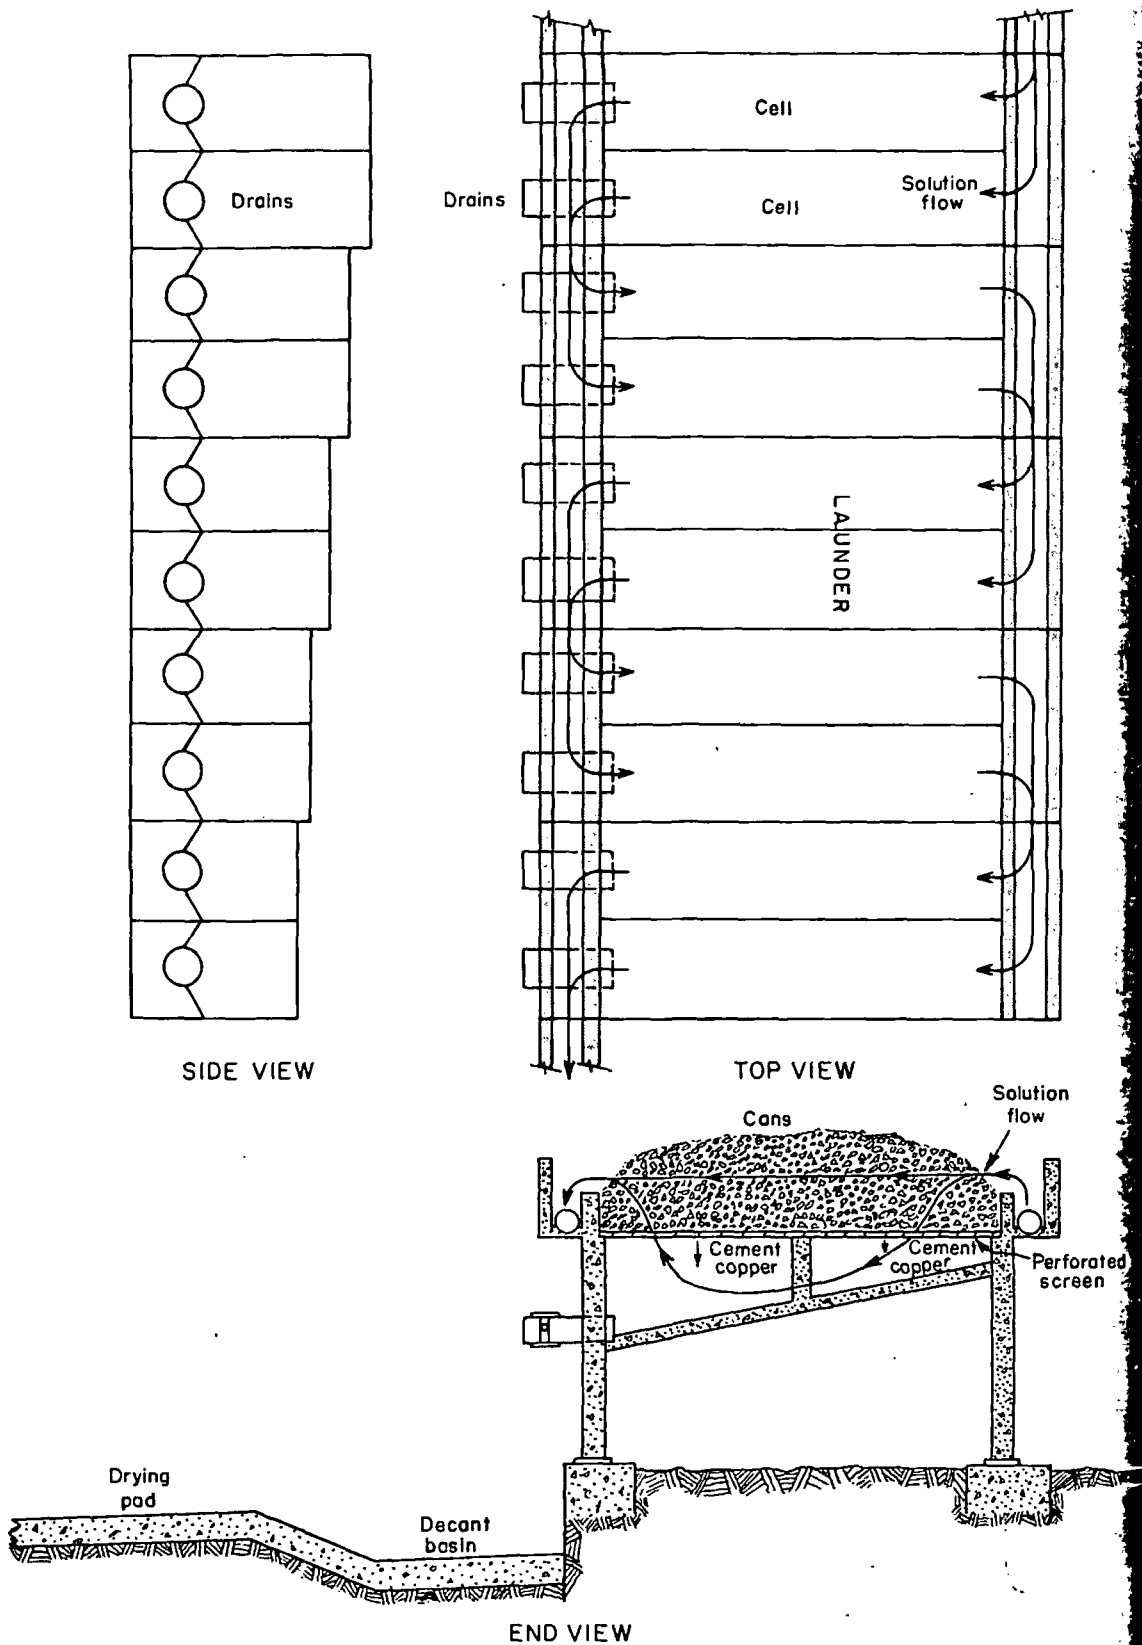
Typical Design of Gravity Launder-Precipitation Plant.
